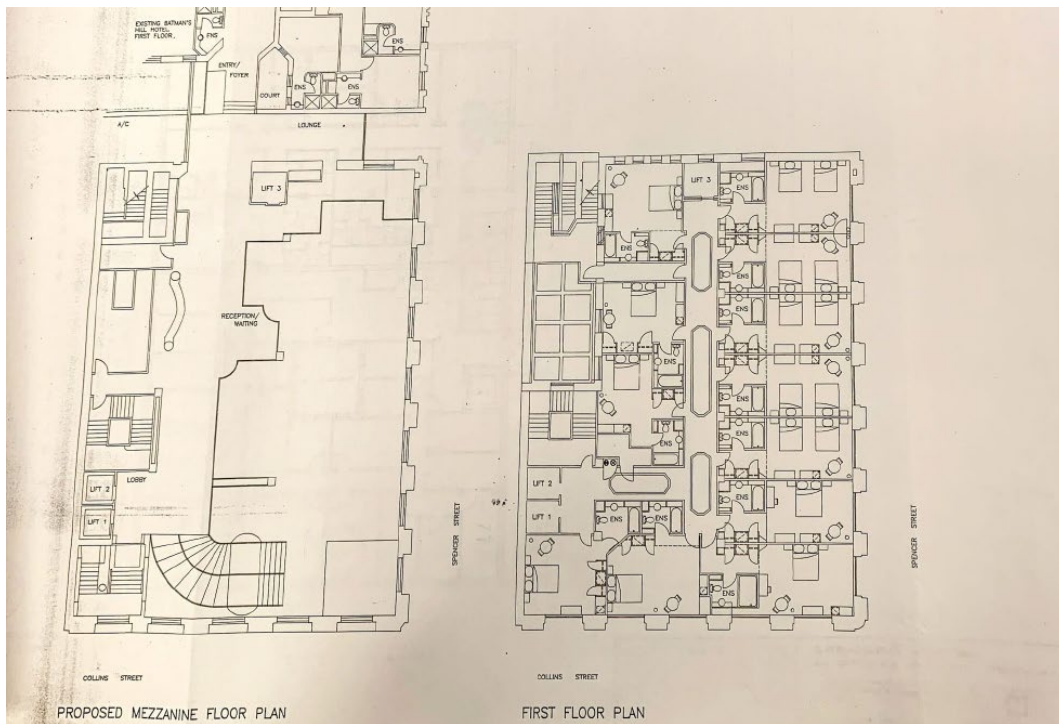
Undated proposed mezzanine and first floor plans, likely associated with the c.1992 works
